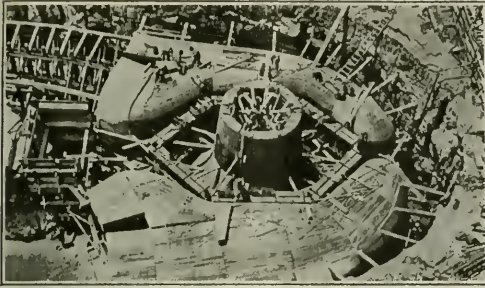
ASSEMBLING FORMS FOR DRAFT TUBE OF UNIT
